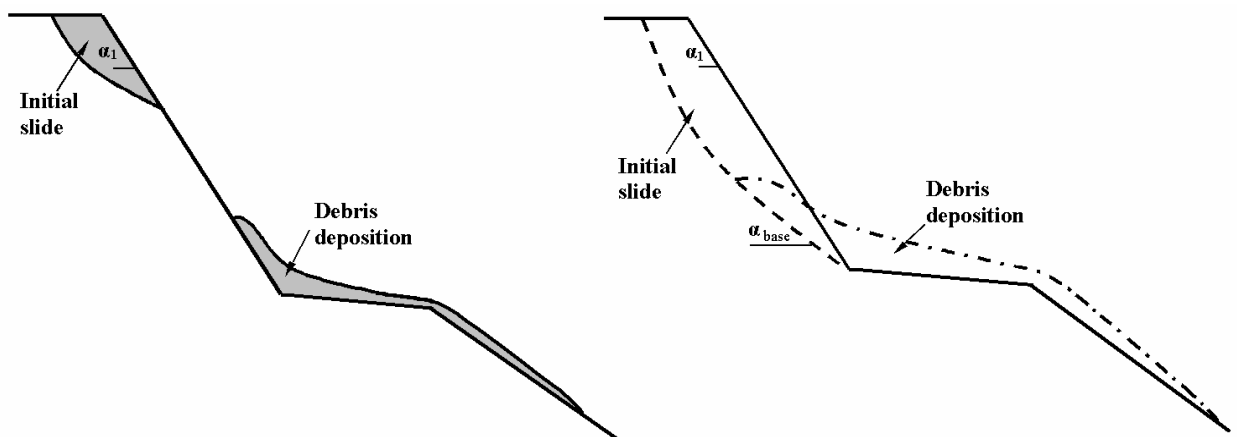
Type 4 slope geometry - post failure travel on changing slope angles from steep to shallow.
